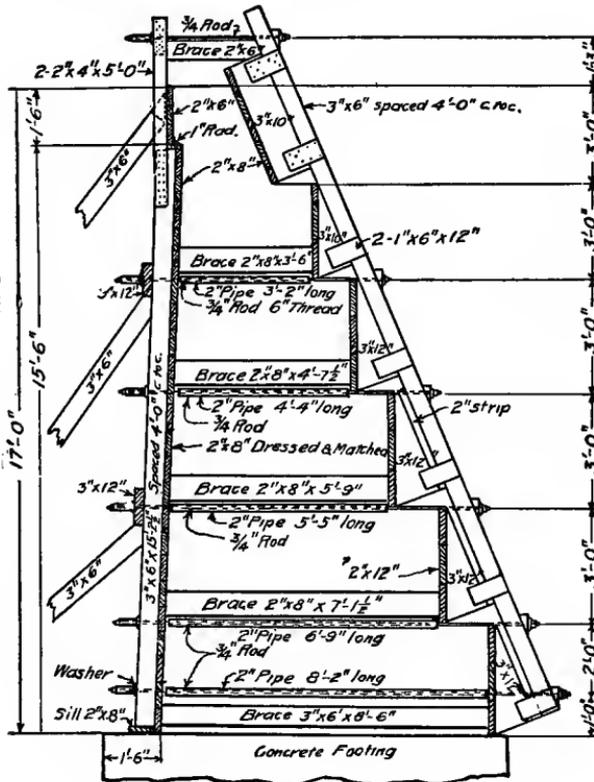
FORM FOR C. & N. W. RETAINING WALL.
